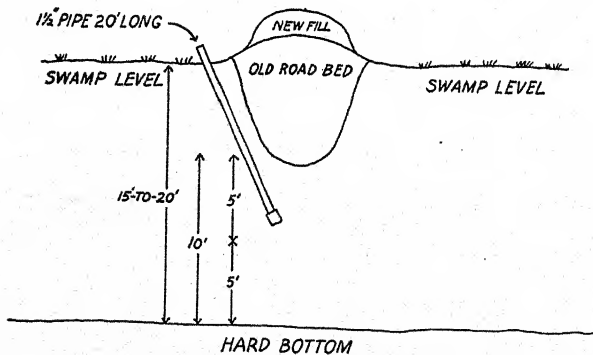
Simplest in swamps not over 20 ft deep where conditions will allow a 20-ft length of pipe to be forced or driven by hand; requires no other equipment than hammers, pipe cutter and other small hand tools
